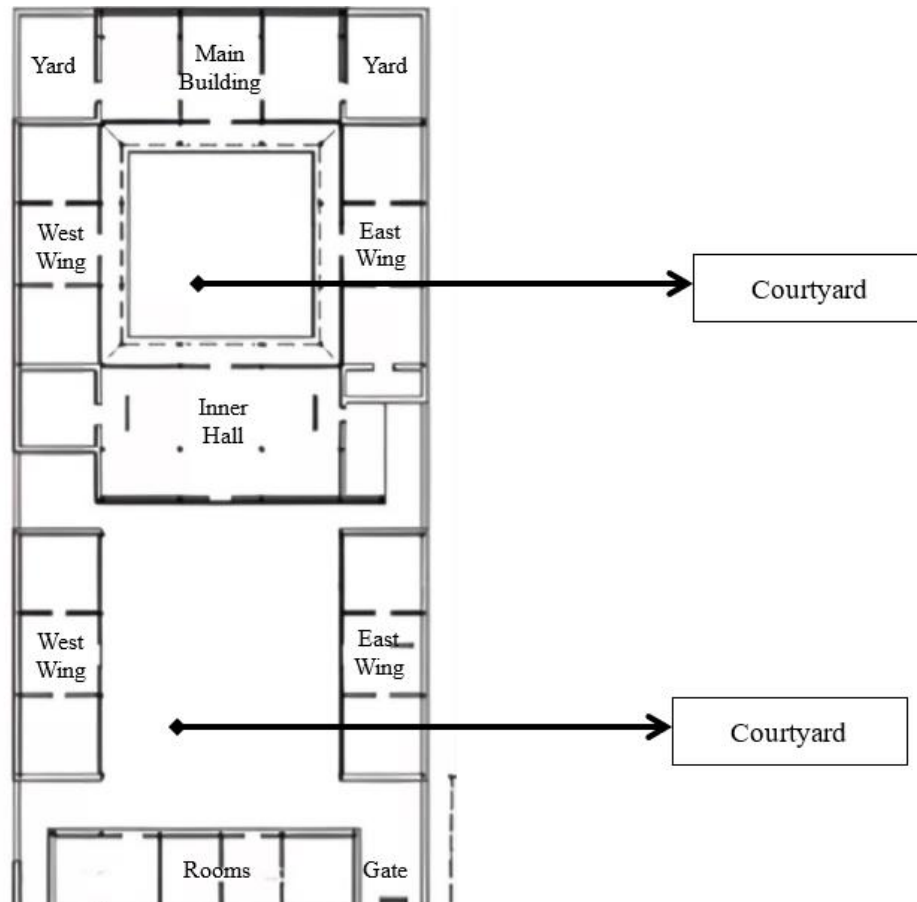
Traditional Chinese Building Floor Plan. (Source: Handinoto, 2008)
